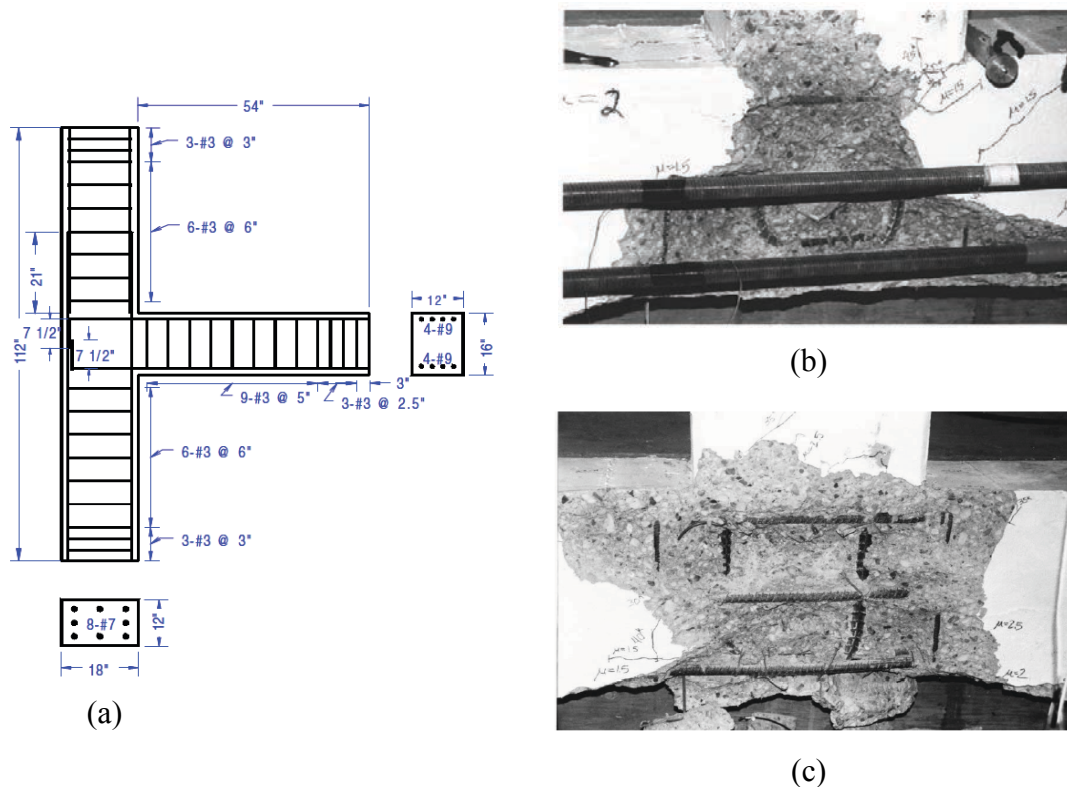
Experimental study by Clyde et al. (2000): (a) Reinforcement details of test specimen; (b) Damage to test specimen under $0.10f'_c A_g$ axial load level; (c) Damage to test specimen under $0.25f'_c A_g$ axial load level.
